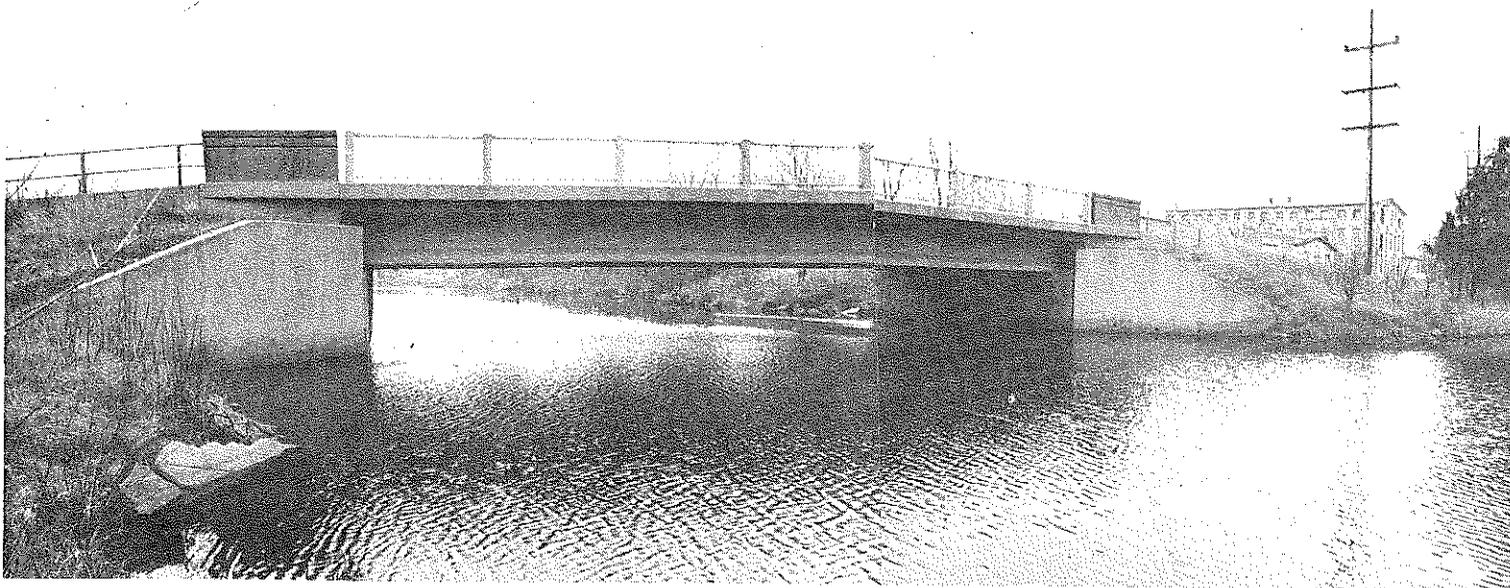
LOOKING DOWNSTREAM TO RODGERS ROAD BRIDGE
